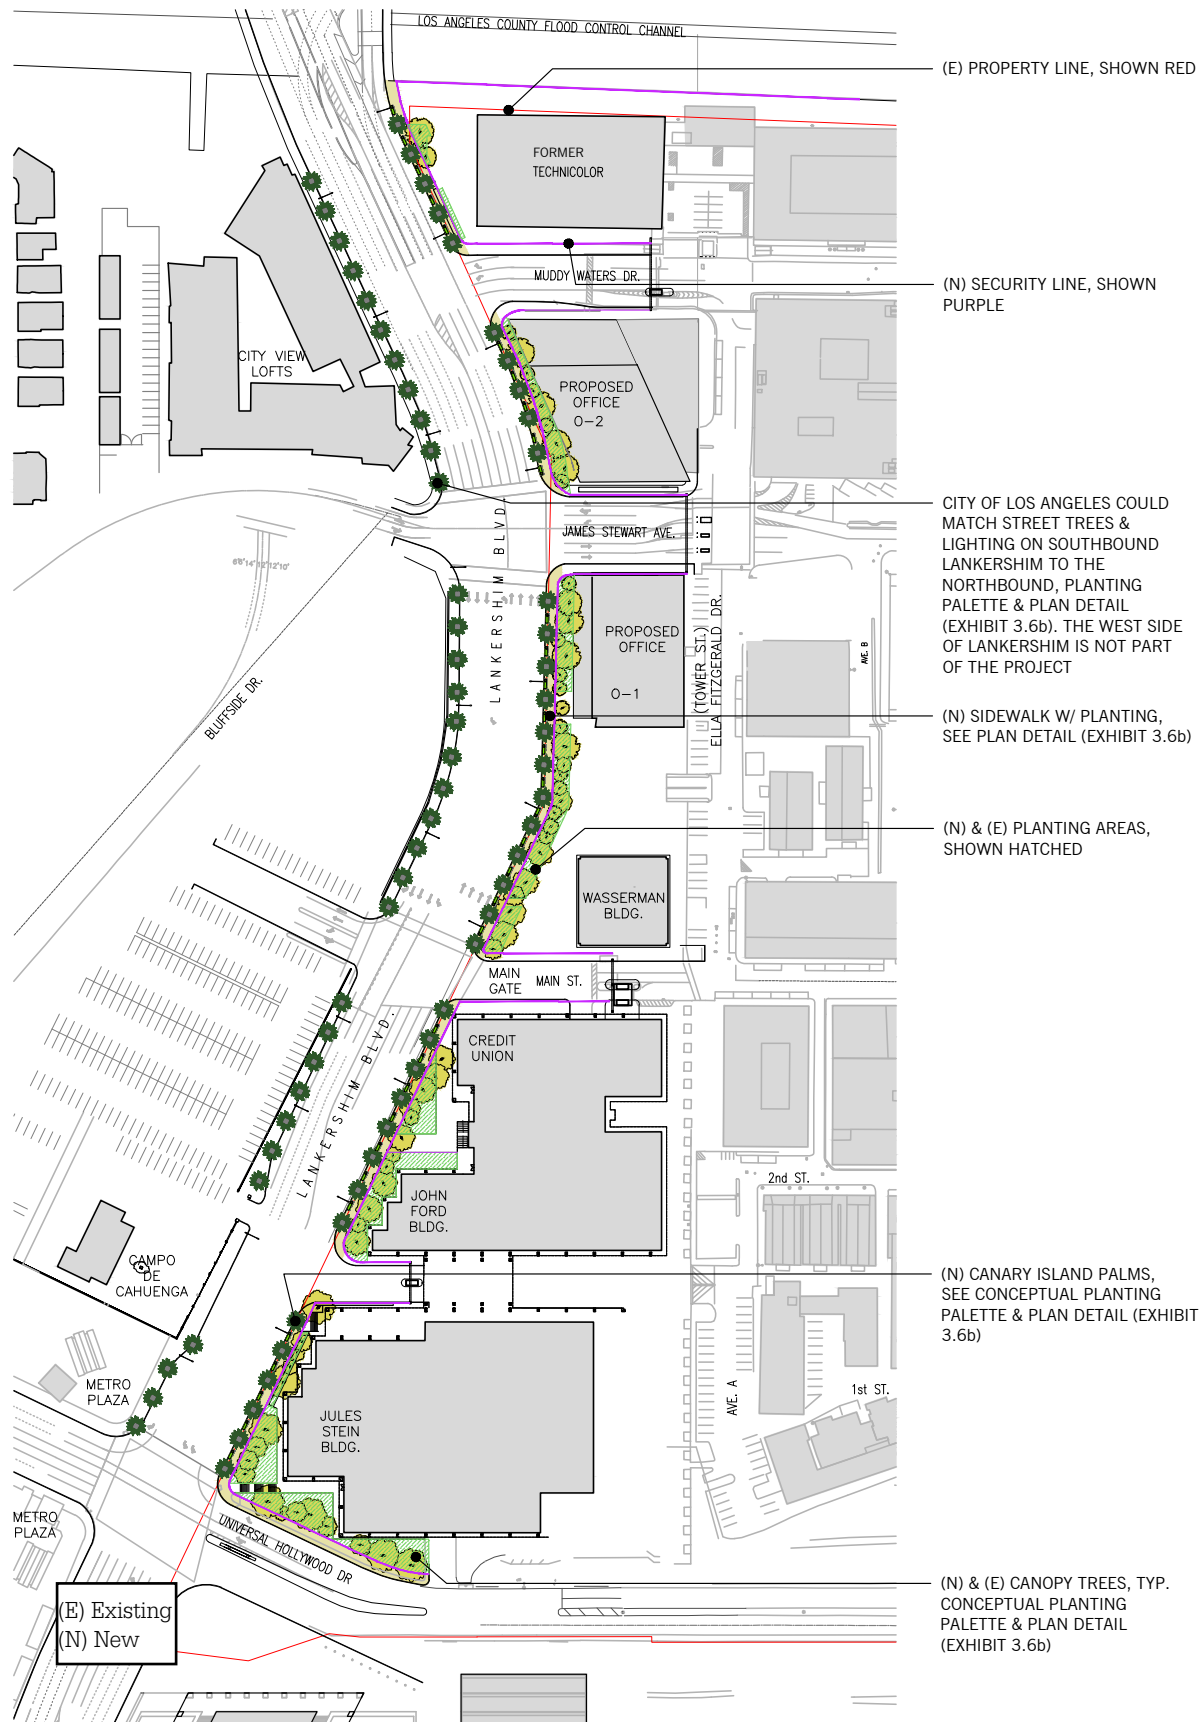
Conceptual Lankershim Streetscape Plan
